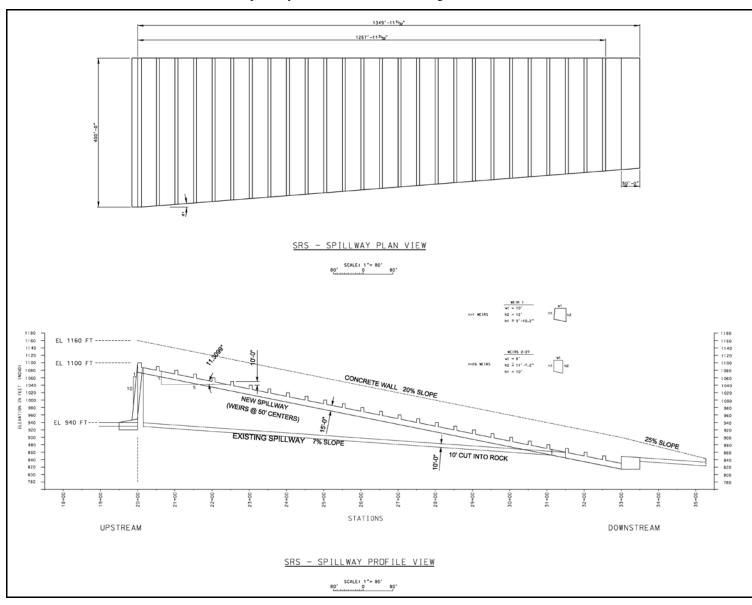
Section and Plan of Potential SRS Spillway Raised 160 feet, Configuration 1
